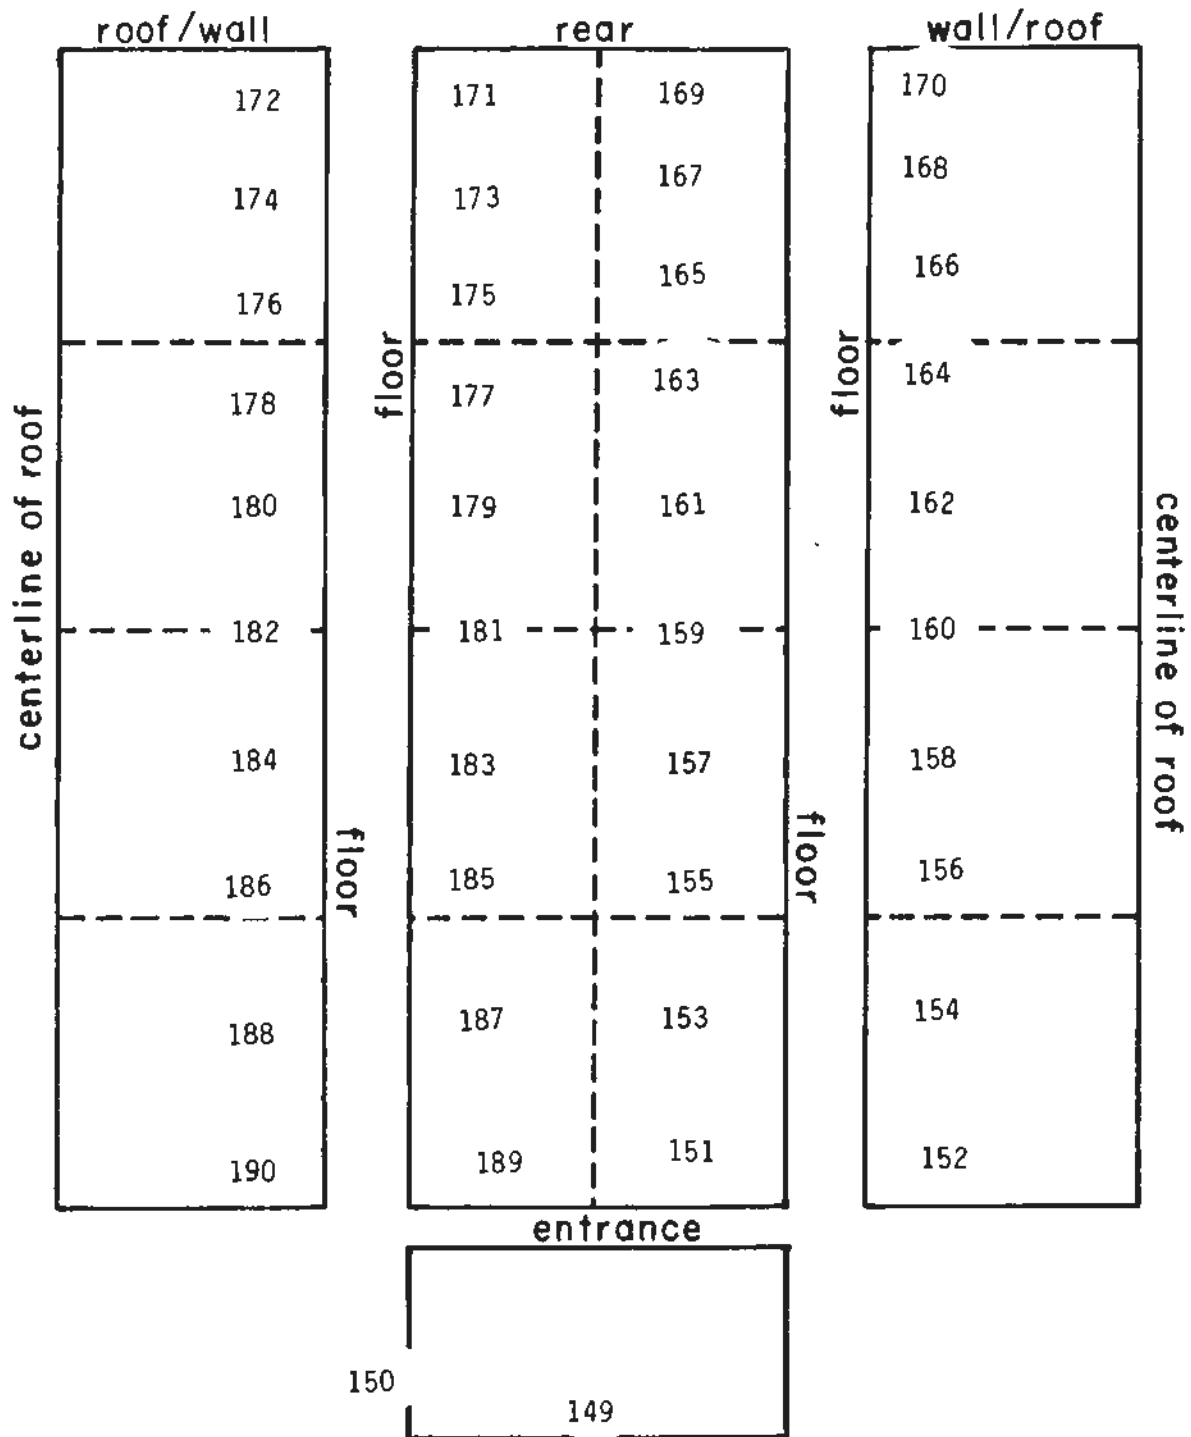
Second Team Surveyed Positions: Building 805 (Interior)
